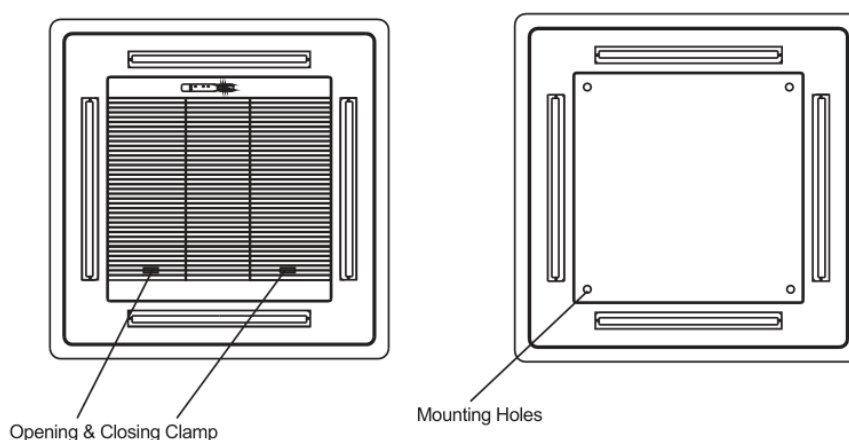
Opening and closing clamp (left) and mounting holes (right)
